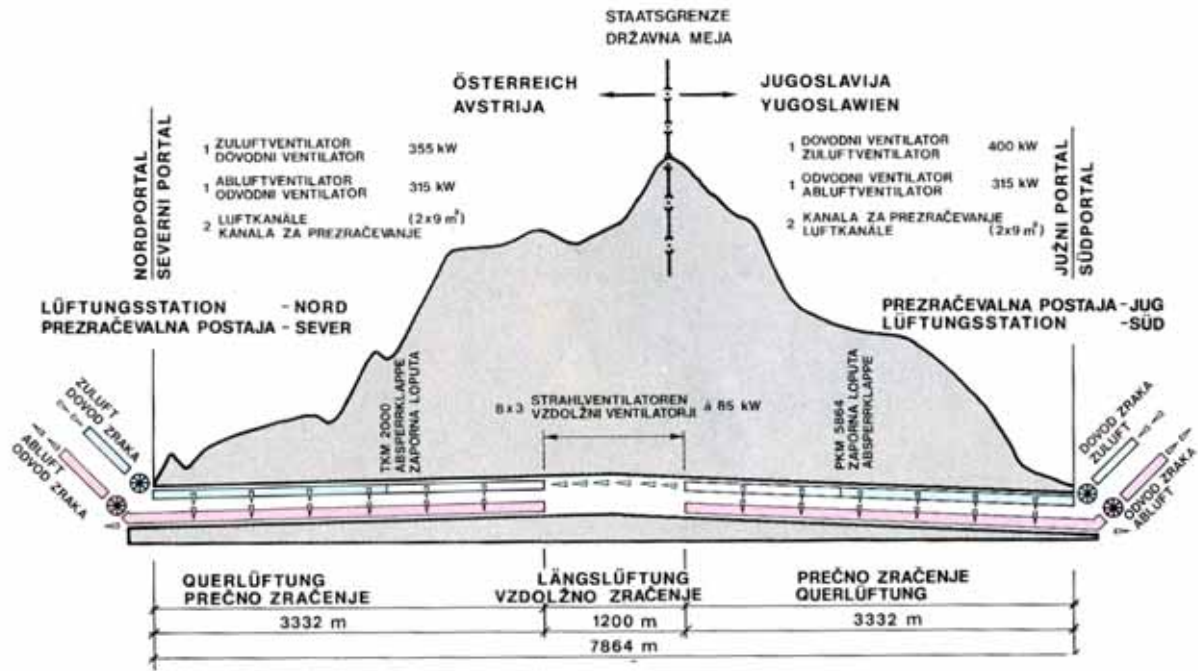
Longitudinal profile showing ventilation system. No ducts for smoke extraction over 1'200 m in the middle of the tunnel
